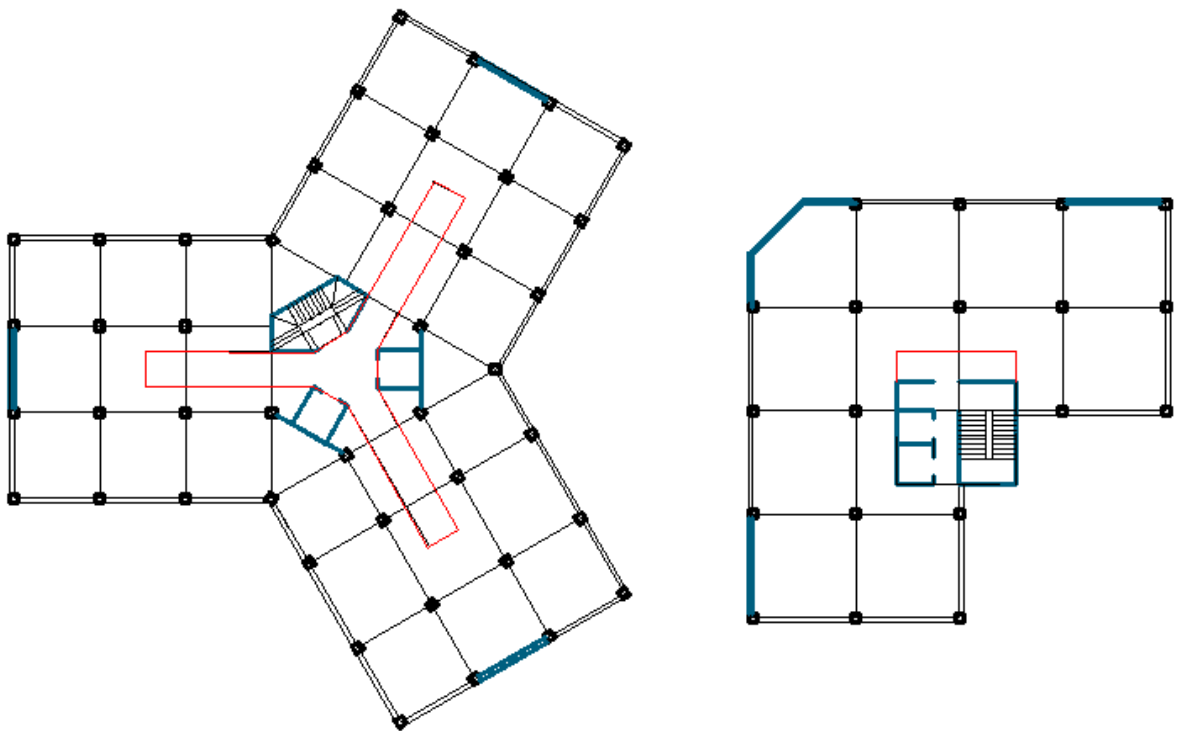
Irregural plan building configurations with elongation in plan: left – three angle structure with plan dimensions 15x15 m with 3 perforated structural wall panels 5m wide located at the front facades and with an enlarged service core placed in the center of the building; right – one angle structure with plan dimensions 12x24 m with perforated structural wall panels 10(3+ 4+3)m width at the center façade and 2 other perforated structural wall panels 6m wide at the side facades of the building and with an enlarged service core placed in the center of the building (source: the author)
